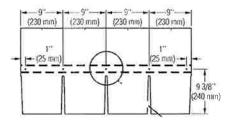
Fastening Halleras Shingles on Low and Standard Slopes
